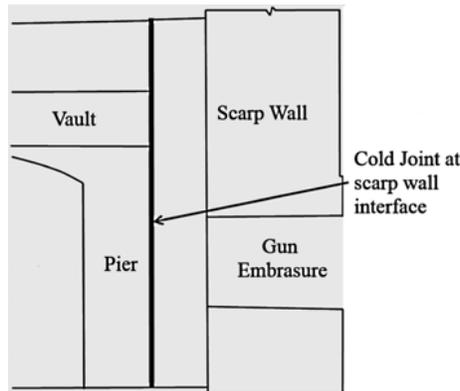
The discontinuity between the scarp wall and barrel vaulted casemate isolates the structural damage to the scarp wall to prevent the casemate from collapsing in the event of an attack.
